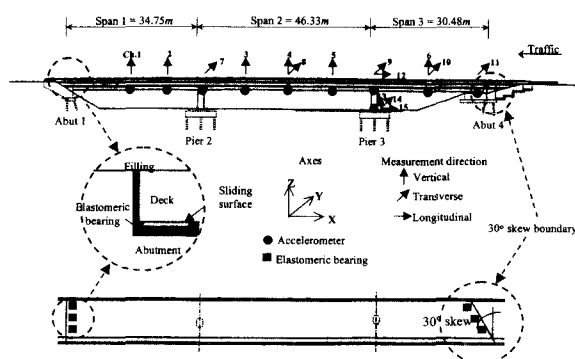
Jamboree road overcrossing and accelerometer arrangement
